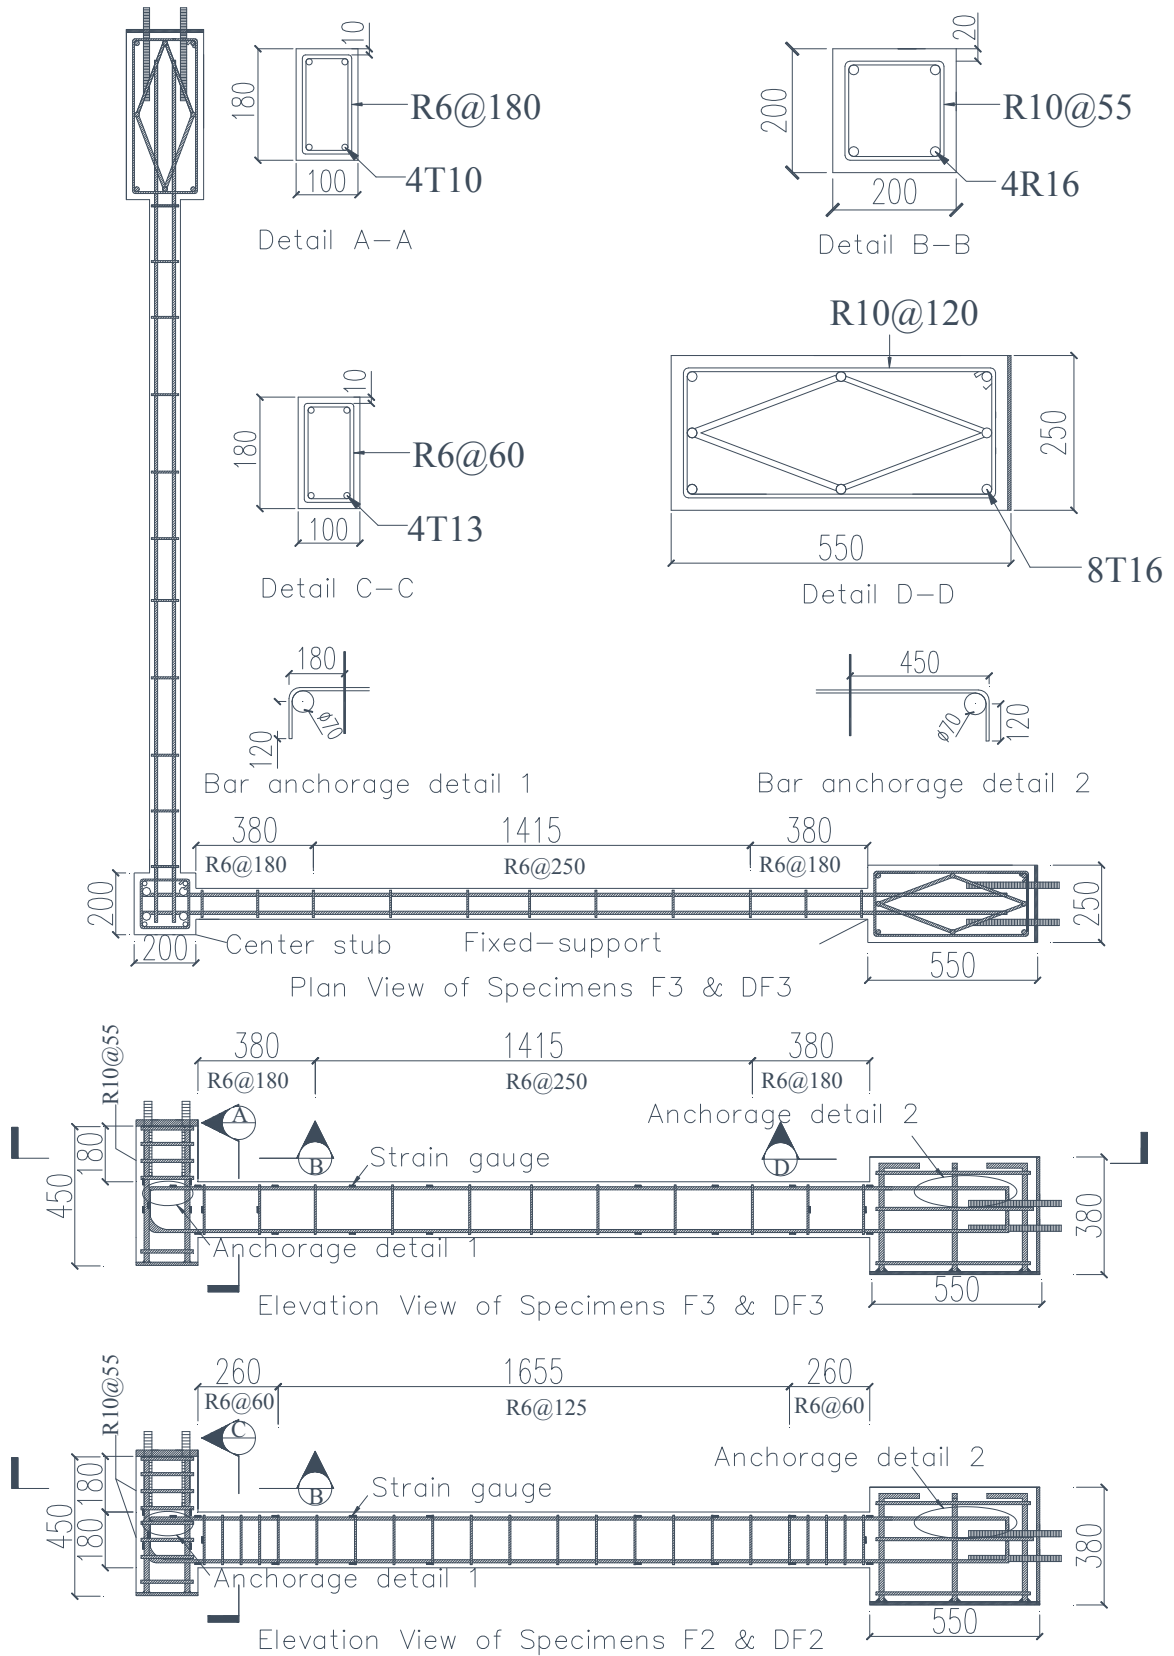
Reinforcement details of typical specimens F3 and F2 (in mm)
